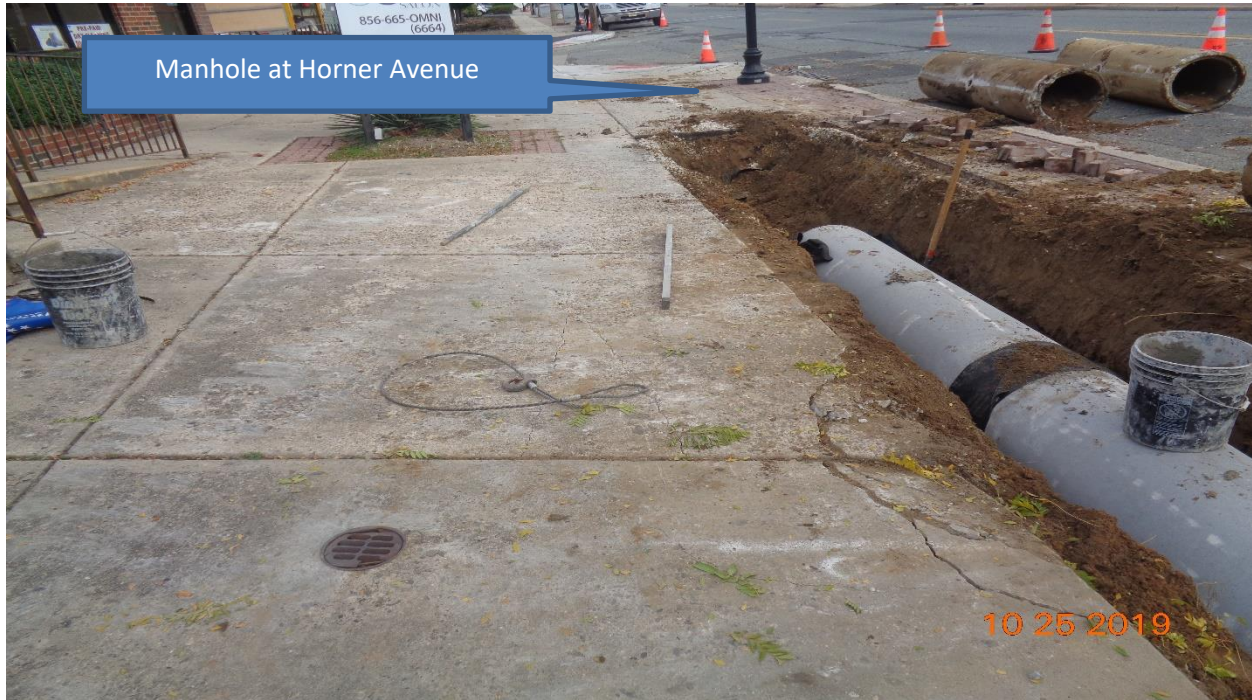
18" Reinforced Concrete Pipe was installed along Westfield Avenue, LT Between Hillcrest Avenue and Horner Avenue
